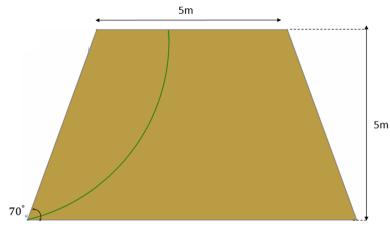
Potential failure plane of the Han Great Wall, providing the reinforcements are taken into account as apparent cohesion (FS = 1.95)
